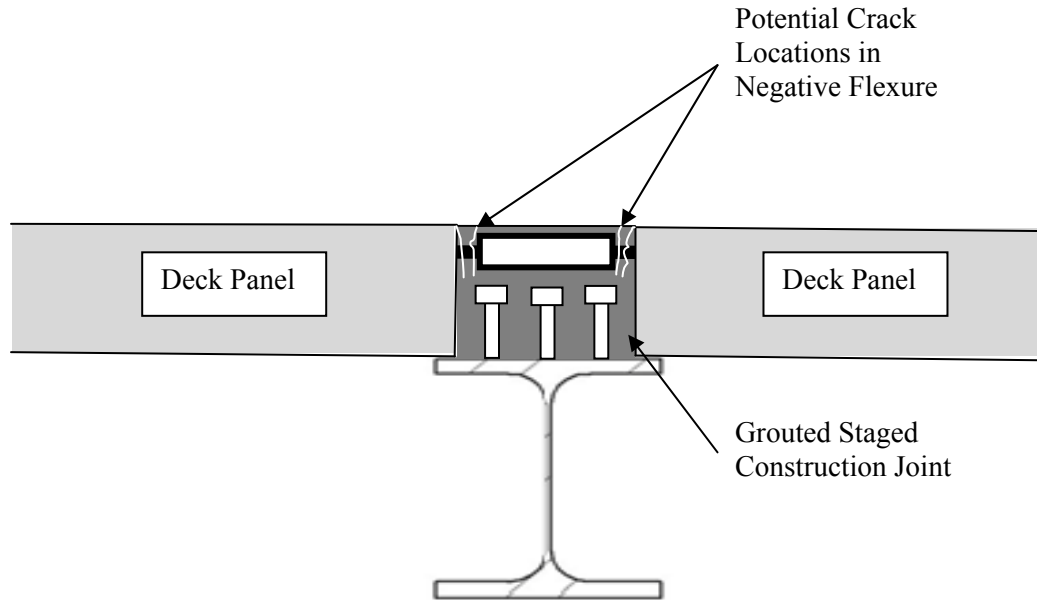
Staged Construction Joint Potential Crack Locations
